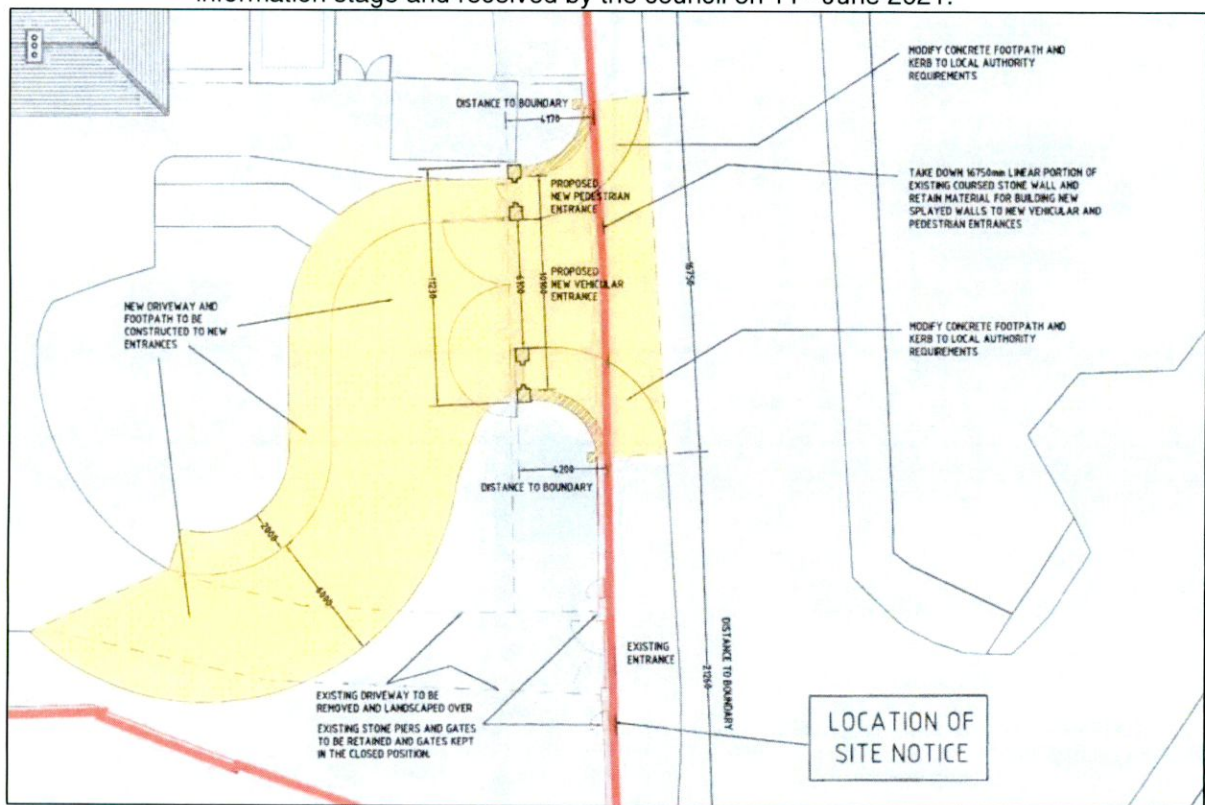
Proposed site layout of entrance arrangements to St. Josephs Presentation Convent.
